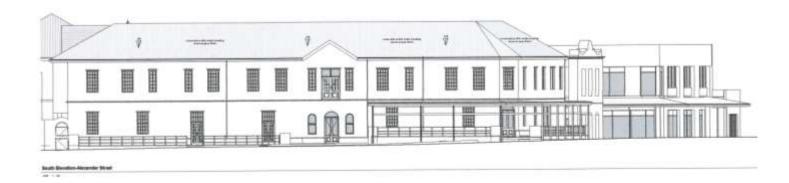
As Built Alexander Street Elevation (DHK Architects)
